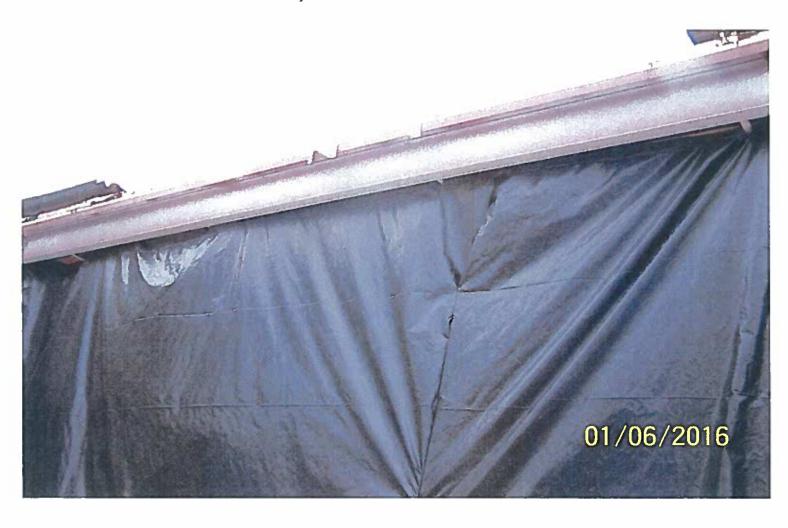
Example of fasteners not having enough penetration into edge angle. Fasteners installed too close to edge of punch-outs
